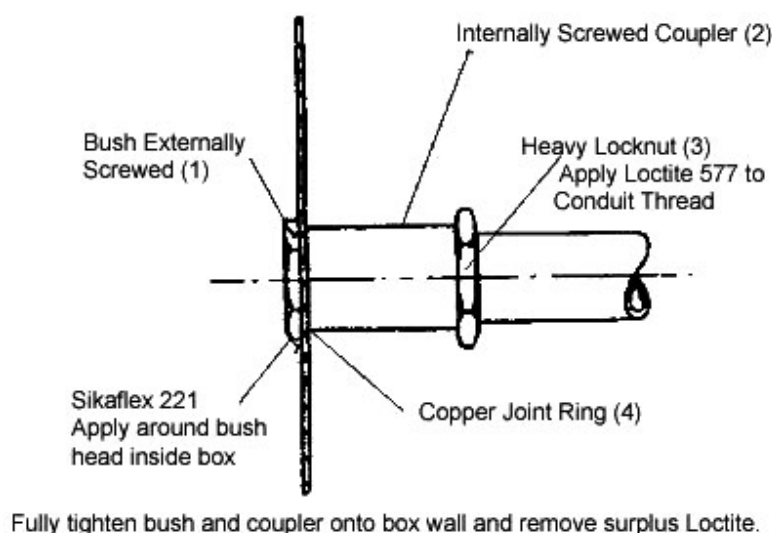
Details of Joint Between Conduits and Outer Terminal Box
